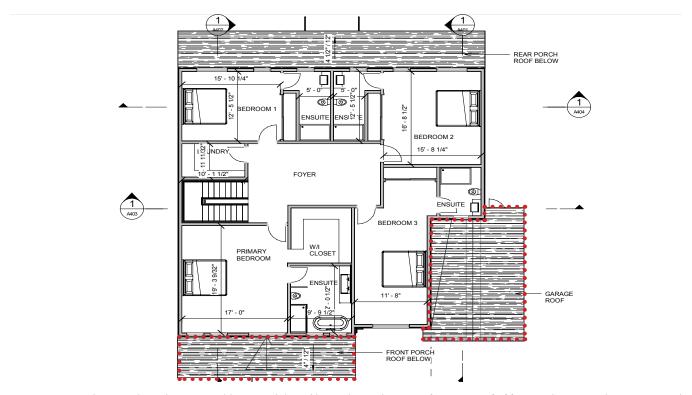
Second Storey Floor Plan. New Addition. Red dotted line indicates location of existing roof of front and garage to be incorporated into addition/renovation. Roof lines appear below second storey. Drawing by Third Layer Architects, 2021.
